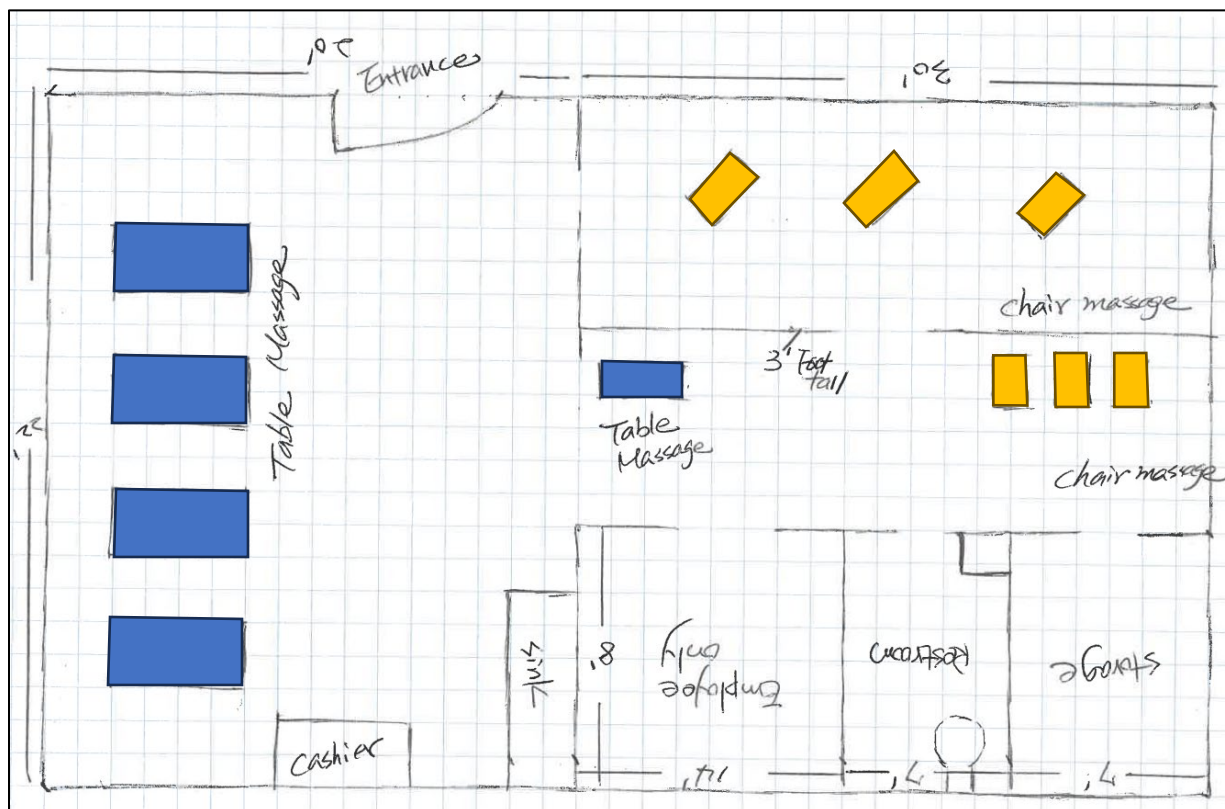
Interior layout and Floor Plan for Diamond Massage. Chair Massage shown in yellow and table massage shown in blue.
